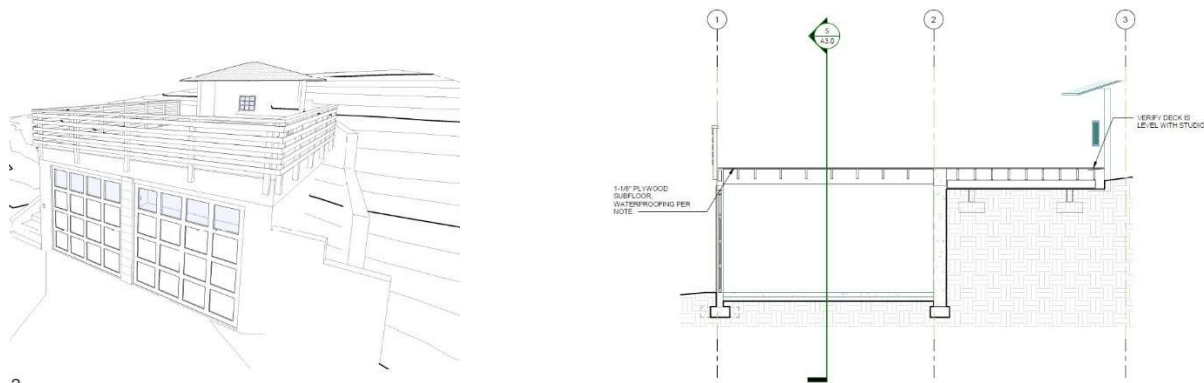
Proposed restoration (Looking North at subject property from Pioneer Street).
